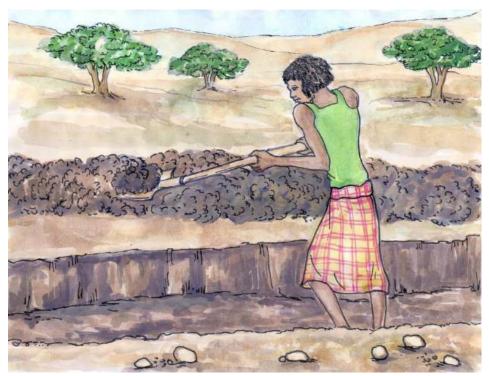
Place excavated soil on the upper side of the weir, at the end of construction soil is filled back right up to the finished walls.
